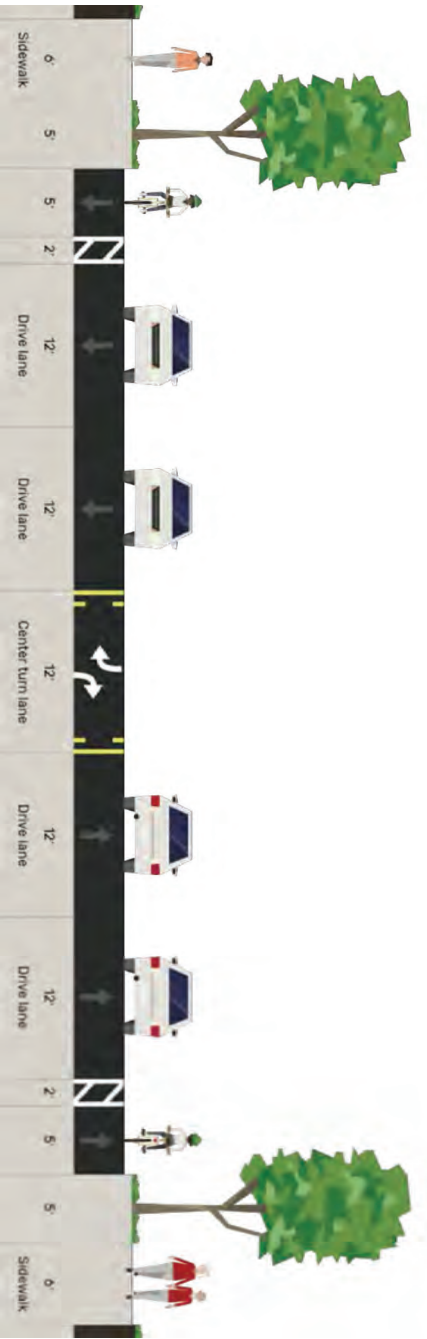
A: RECOMMENDED PRINCIPAL ARTERIAL – MIXED USE STREET CROSS-SECTION (SOURCE: STREETMIX)
